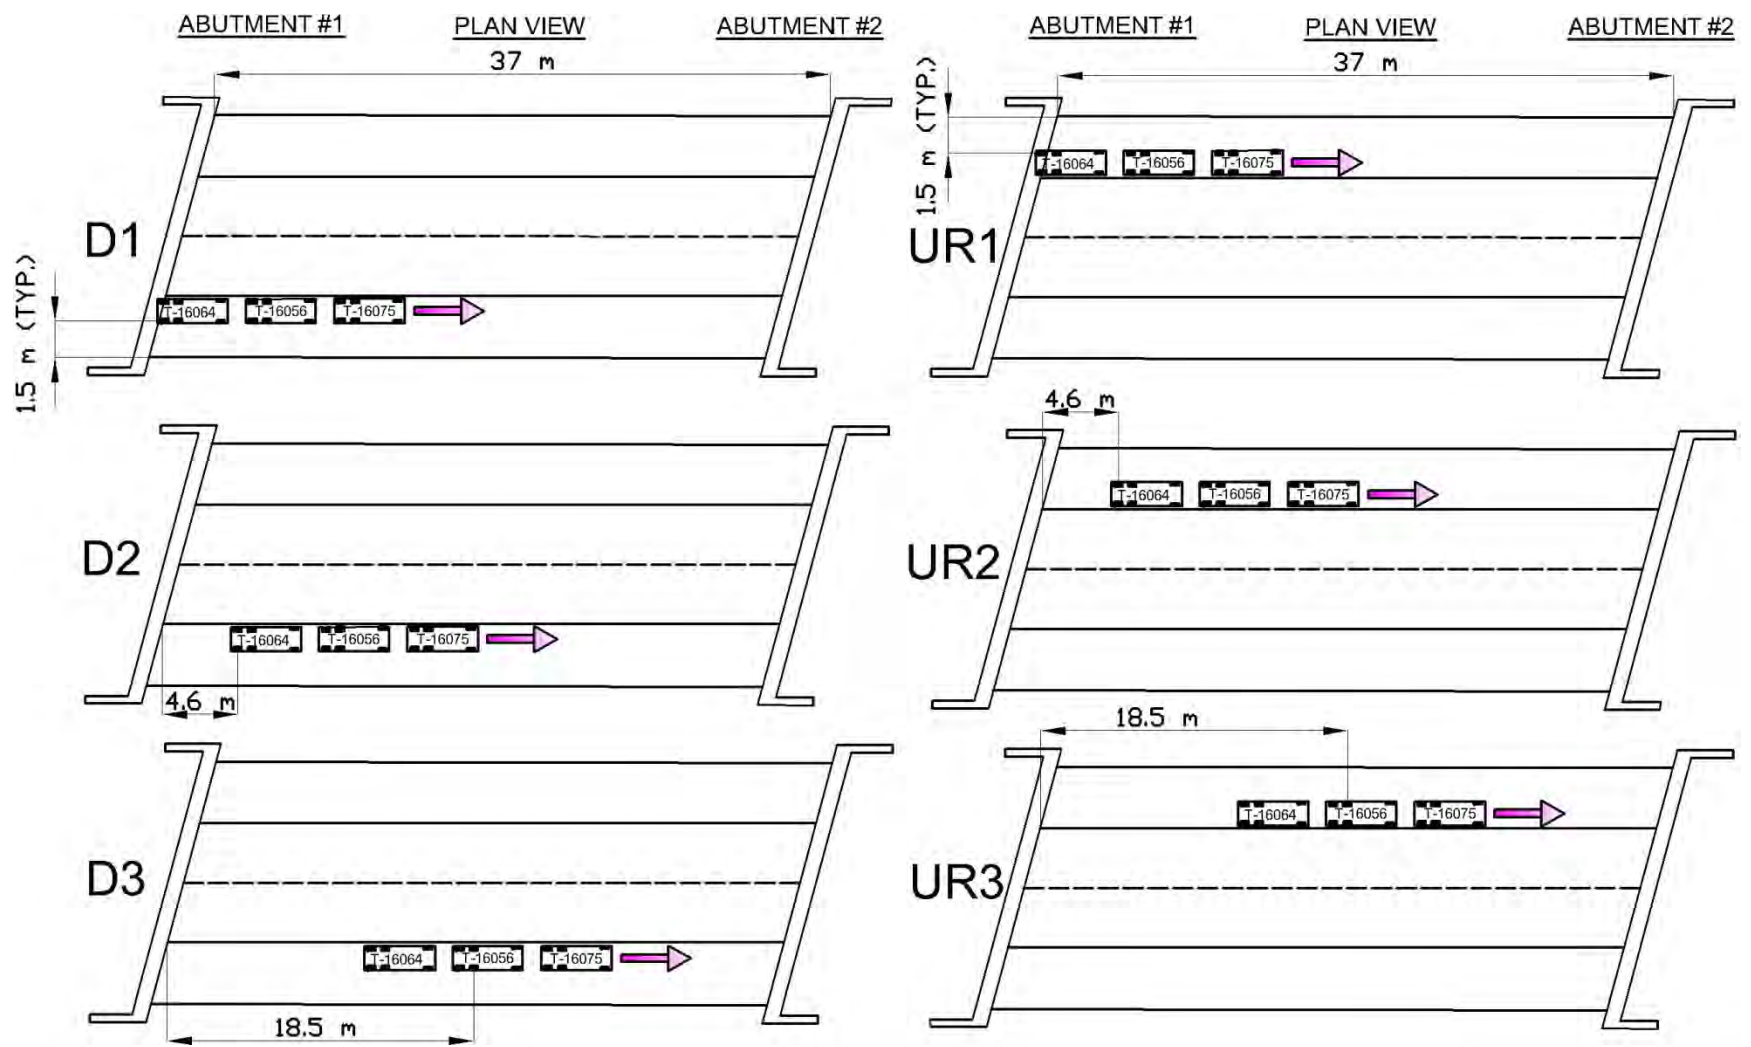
East Montpelier Load Testing Truck Locations (Downstream Lane – Forward and Upstream – Reverse)
